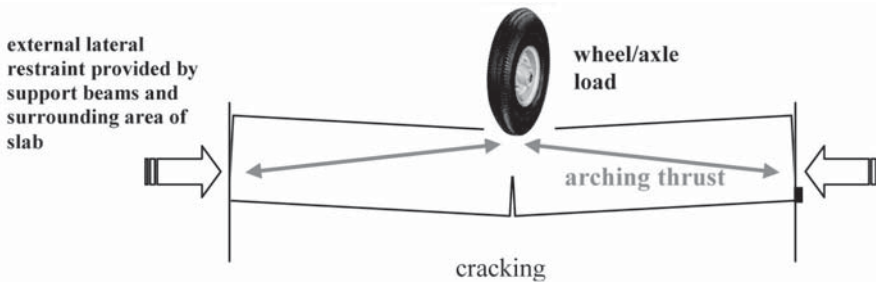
top: Arching action in a typical concrete bridge deck slab.
